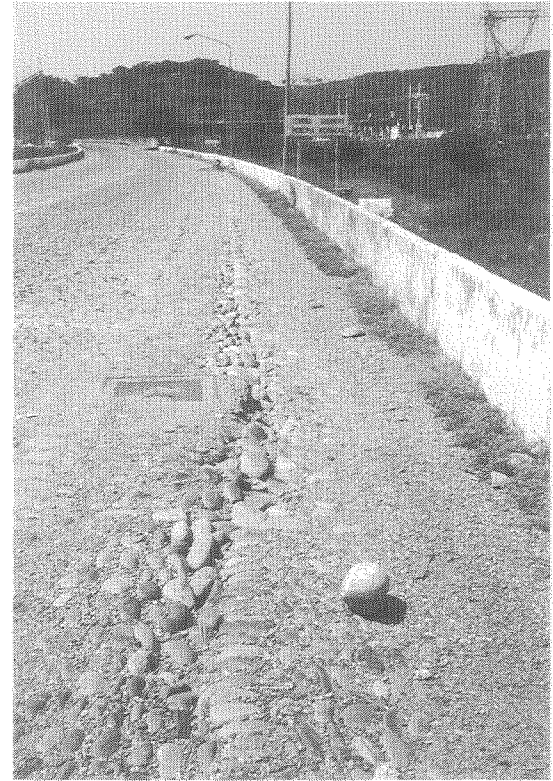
; Longitudinal crack along the shoulder of upstream slope, La Villita Dam.
